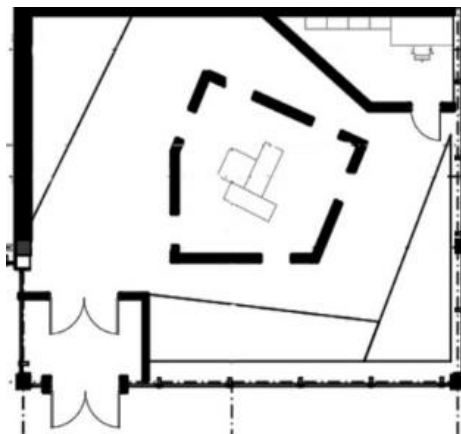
Floor plan of the museum in Building 7 [[made by the authors]]
